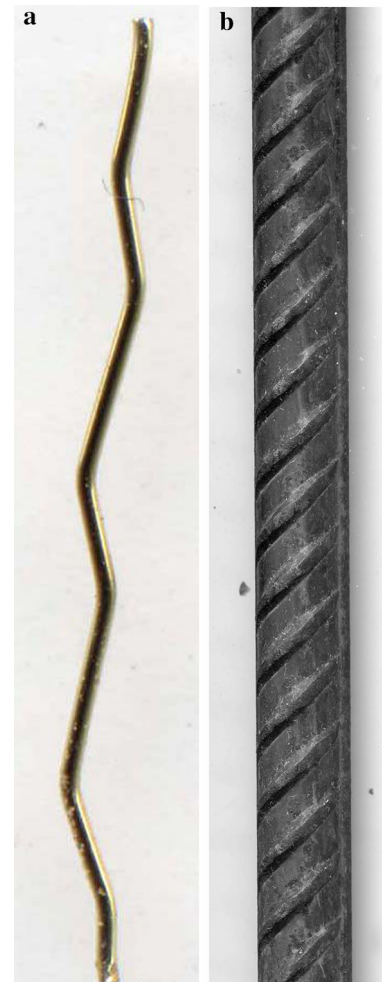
a The steel wave fiber; b Steel rebar diameter: 8 mm
